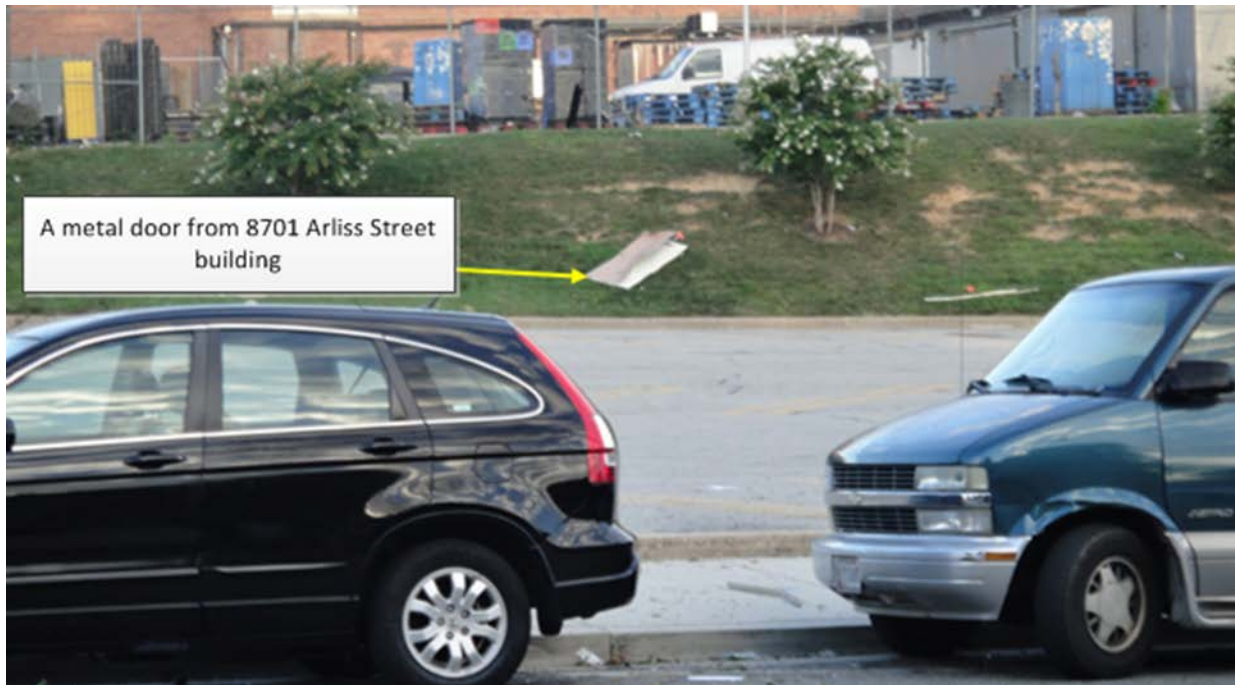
metal door from 8701 Arliss Street building blown to an open field across the street and a parking lot.
